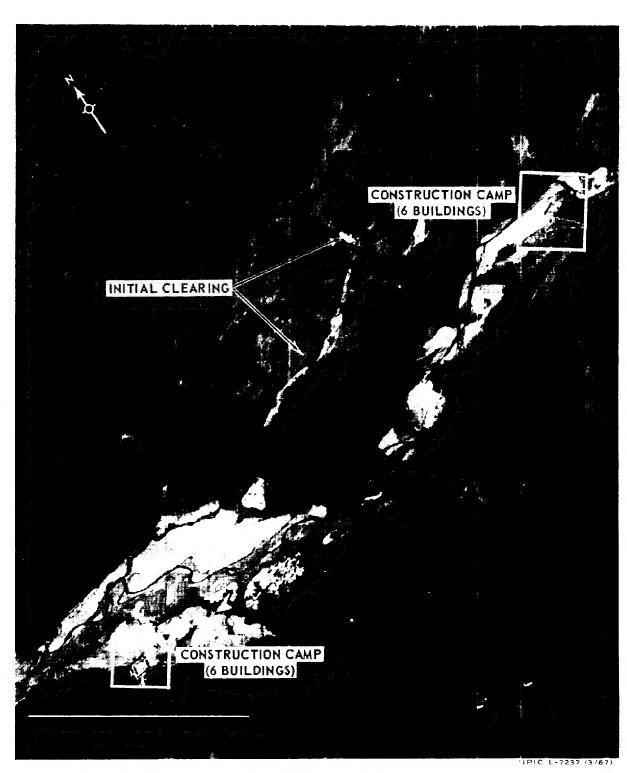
ROAD CONSTRUCTION 22-22N 101-35E., YUN- NAN PROVINCE, CHINA
